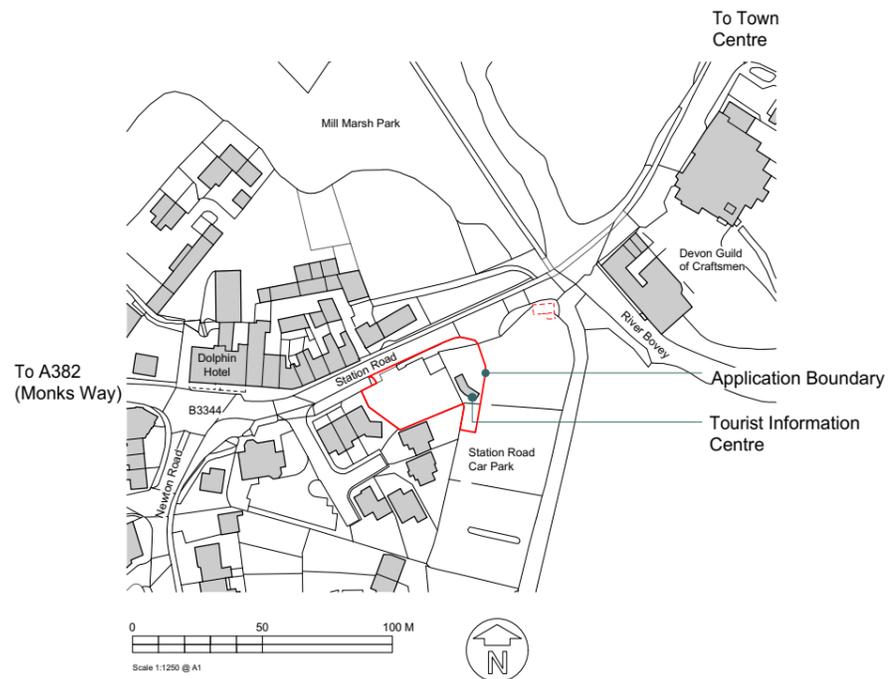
Location Plan taken from drawing - 1690_S_01 - not to scale
